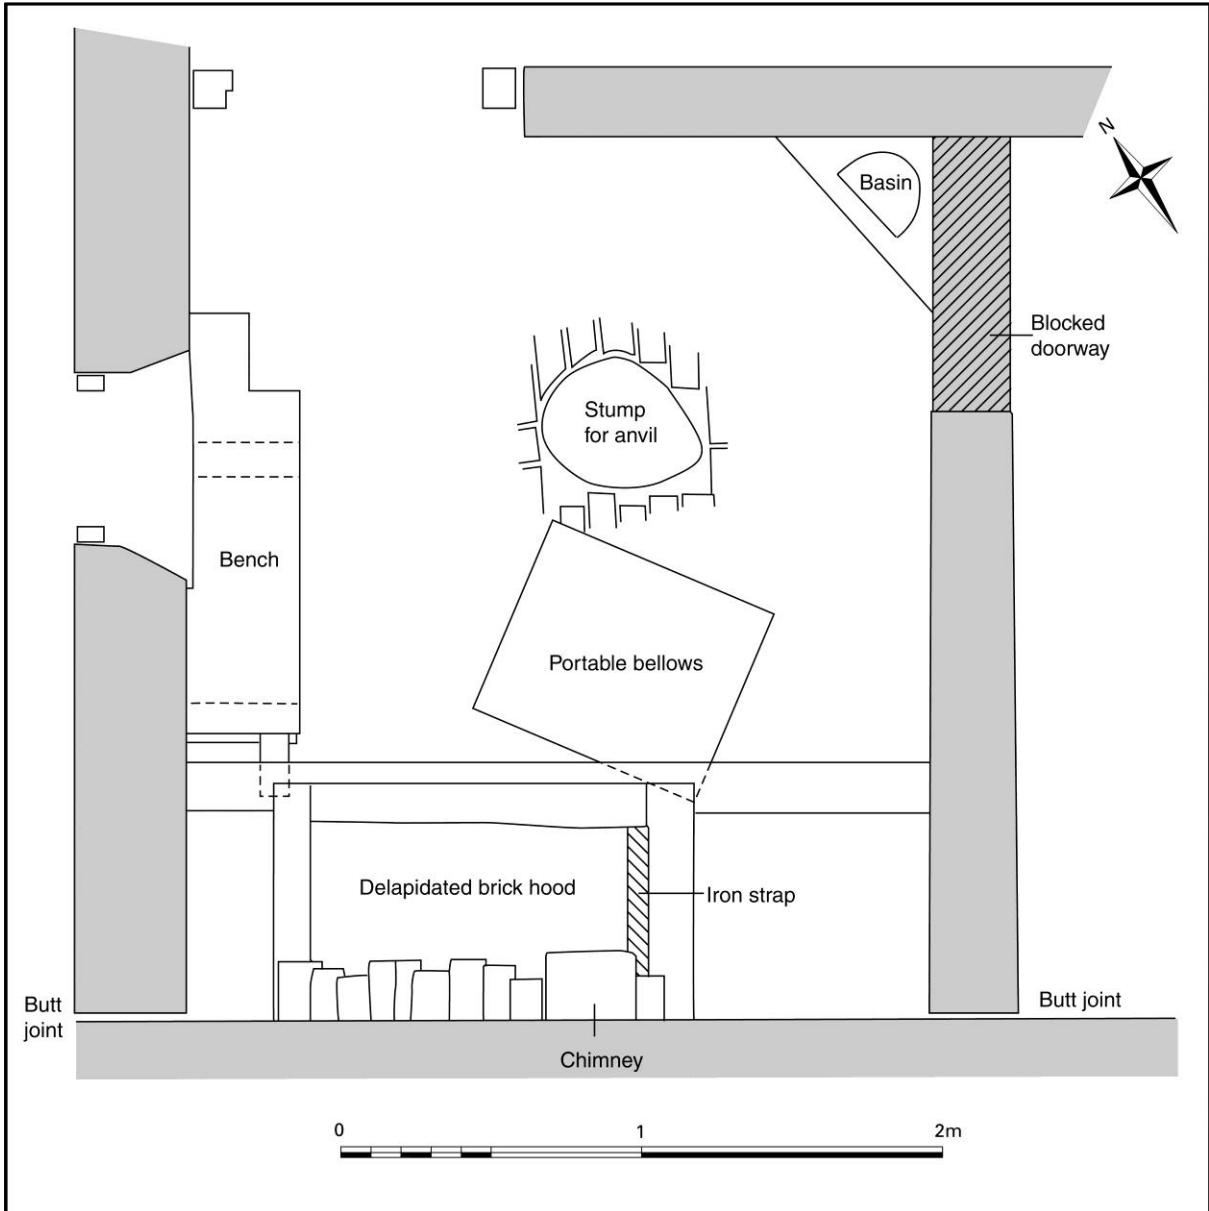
plan of the forge layout. Note the surrounding brickwork butt-joints (Andy Isham).
